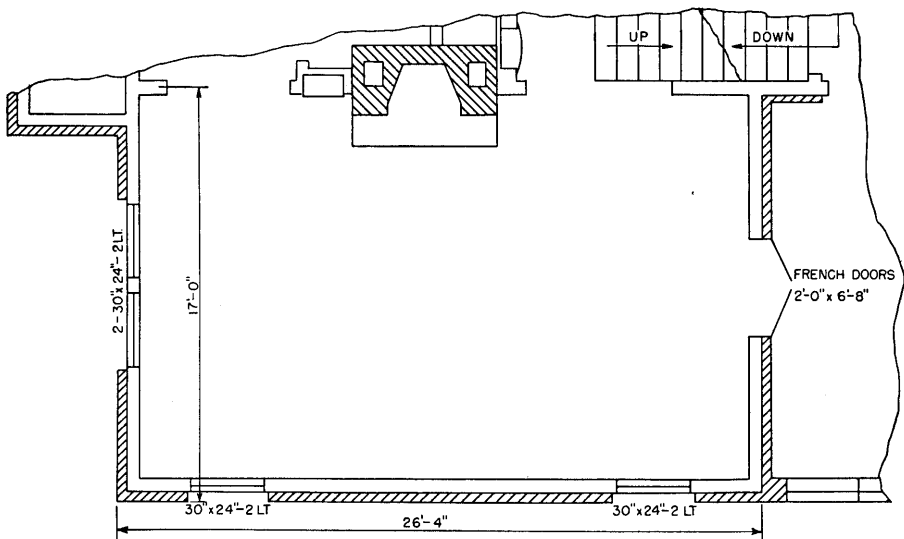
TYPICAL LIVING ROOM USED IN ANALYSIS OF CHILLING EFFECT RESULTING FROM COLD OUTSIDE WALLS AND WINDOWS
